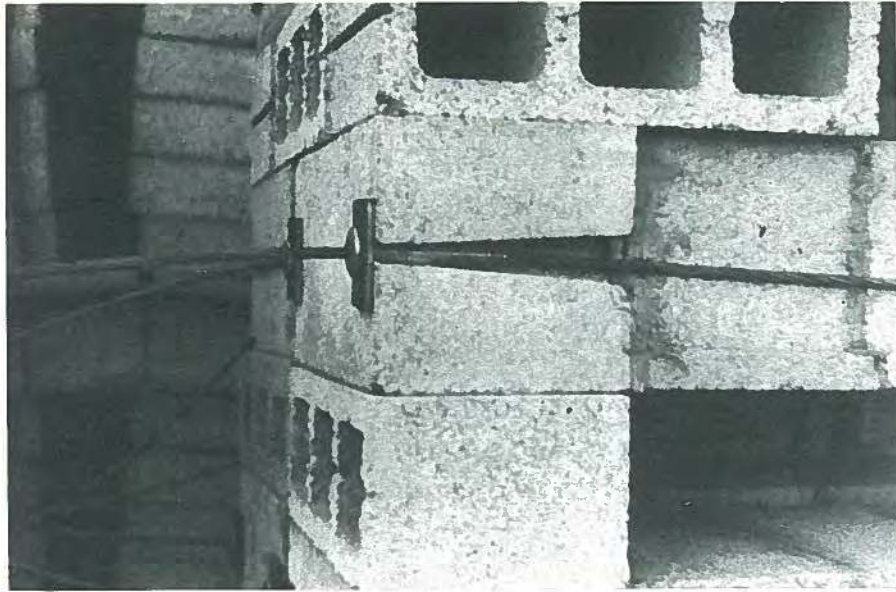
An 8-in. (203 mm) building beam with bonded strands.
